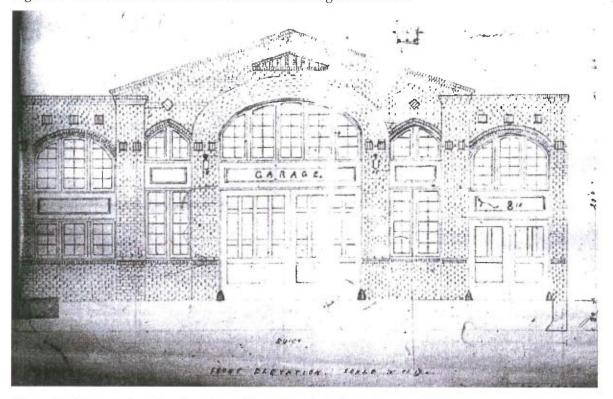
Original elevation drawing of the subject building. Source: SF DBI.
